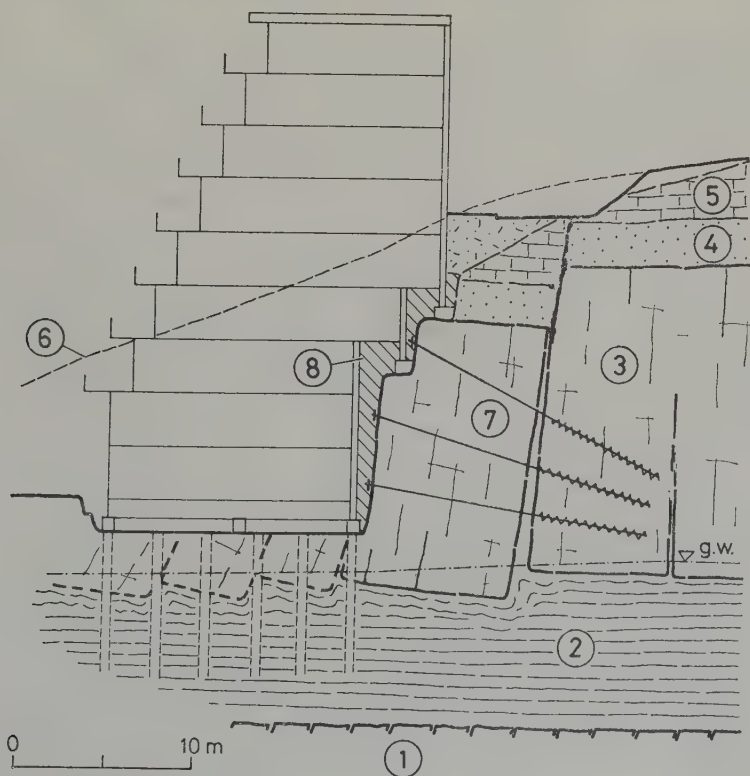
Construction of terraced blocks of flats in an abandoned quarry; 1 — Ordovician shales, 2 — Cenomanian clays, 3 — Cenomanian sandstones, 4 — glauconitic sandstone, 5 — Turonian marls, 6 — original slope surface, 7 — steel anchors, 8 — concrete back-fill.
